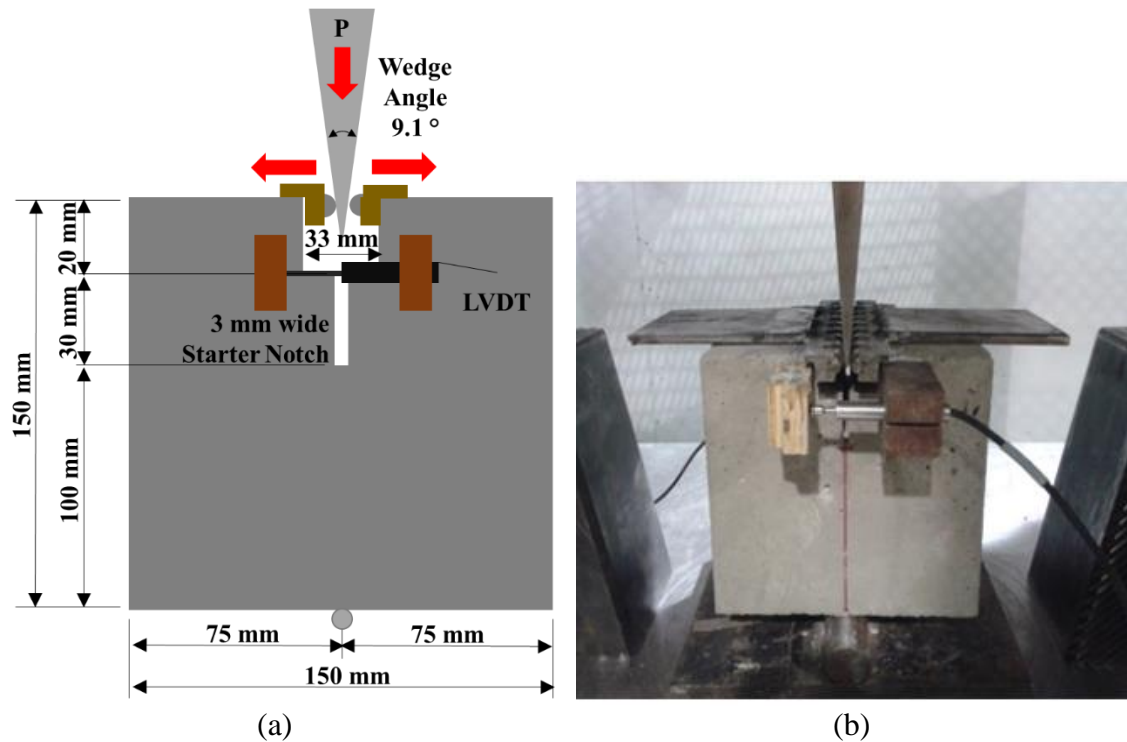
(a) Schematic showing the dimensions of a 150 mm wedge split test specimen, with the wedge vertically thrust between the roller bearings to induce a horizontal tensile splitting force, and (b) test specimen being loaded with the wedge split tension apparatus and LVDTs mounted on either side of the specimen
